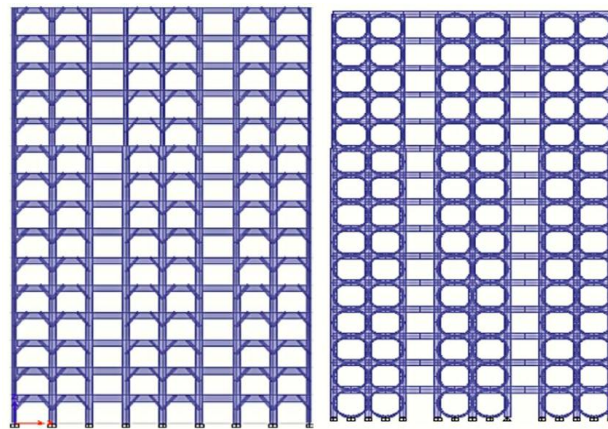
15 Storey Knee bracing and O grid bracing Frames
